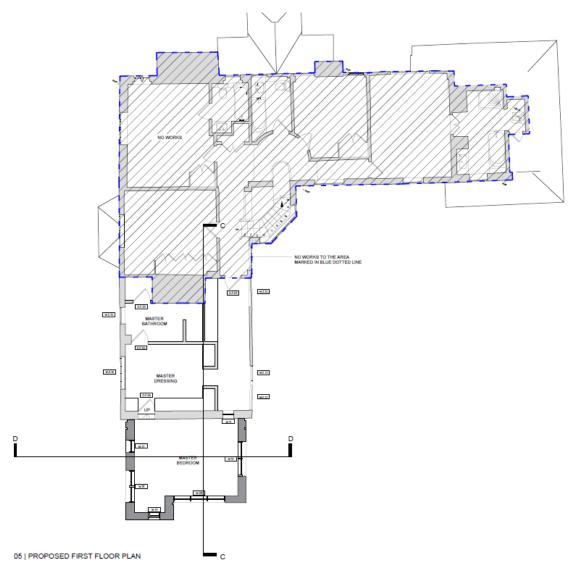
Proposed First Floor Plan (Robinson Van Noort, 2023)
